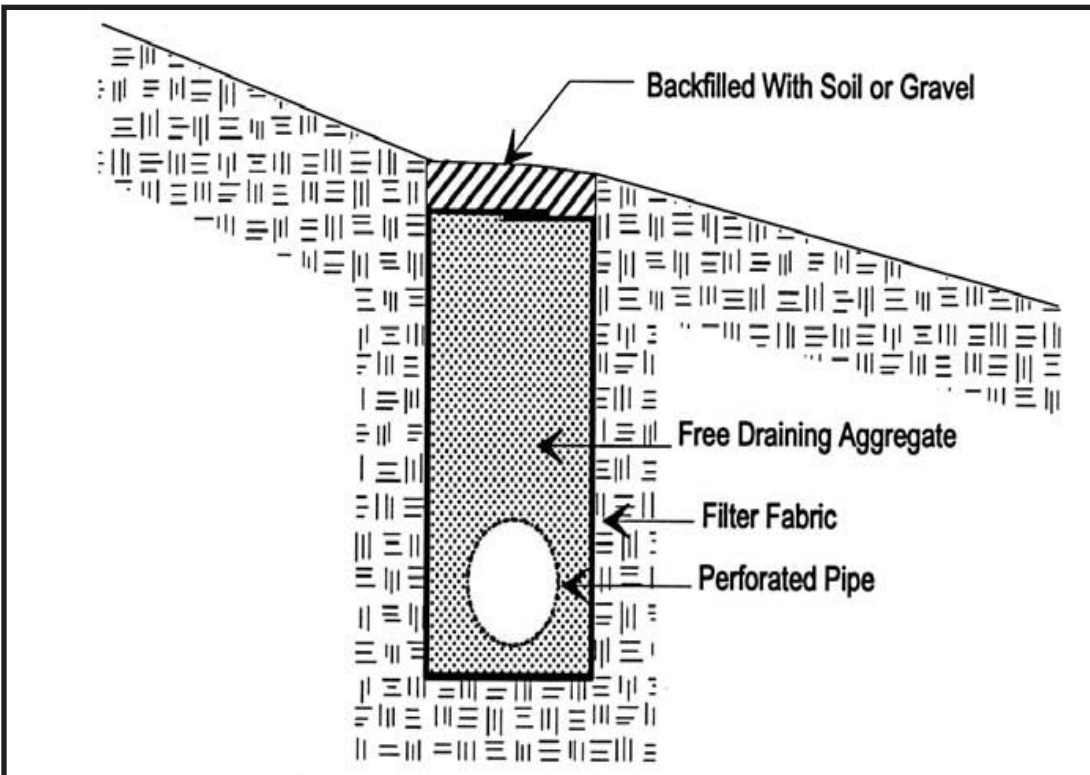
Typical Detail for Installation of Subsurface Drain
